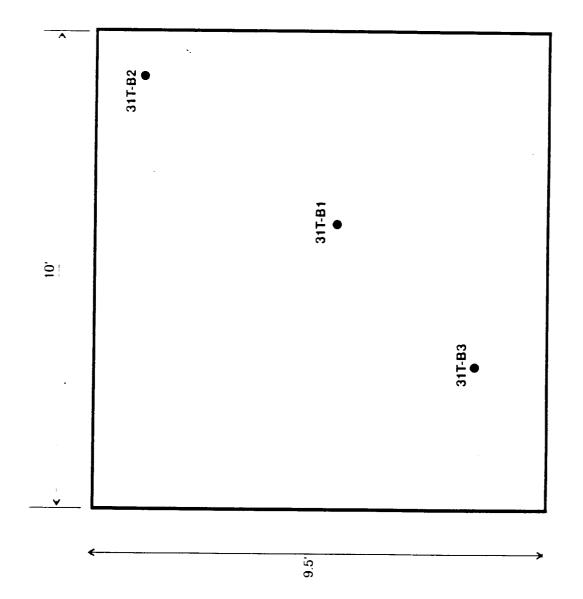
SOIL BORING LOCATIONS FOR PIT NO. 31T
